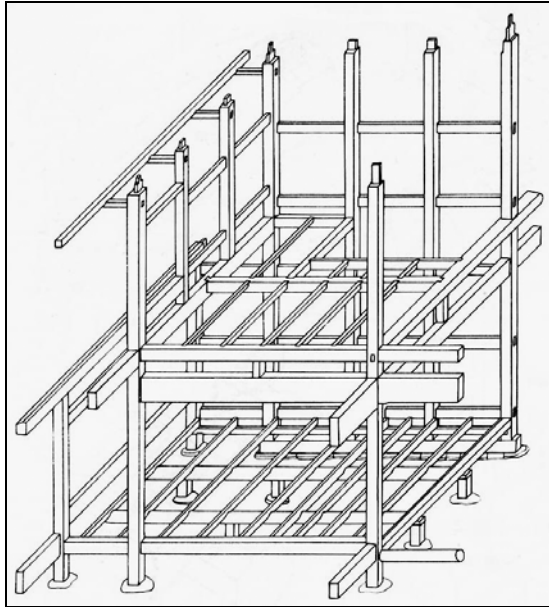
Lateral load bearing system of Takagi house, early 19th century in Nara (source: Architectural Institute of Japan, Kouzouyou kyouzai, Tokyo, 1985).
